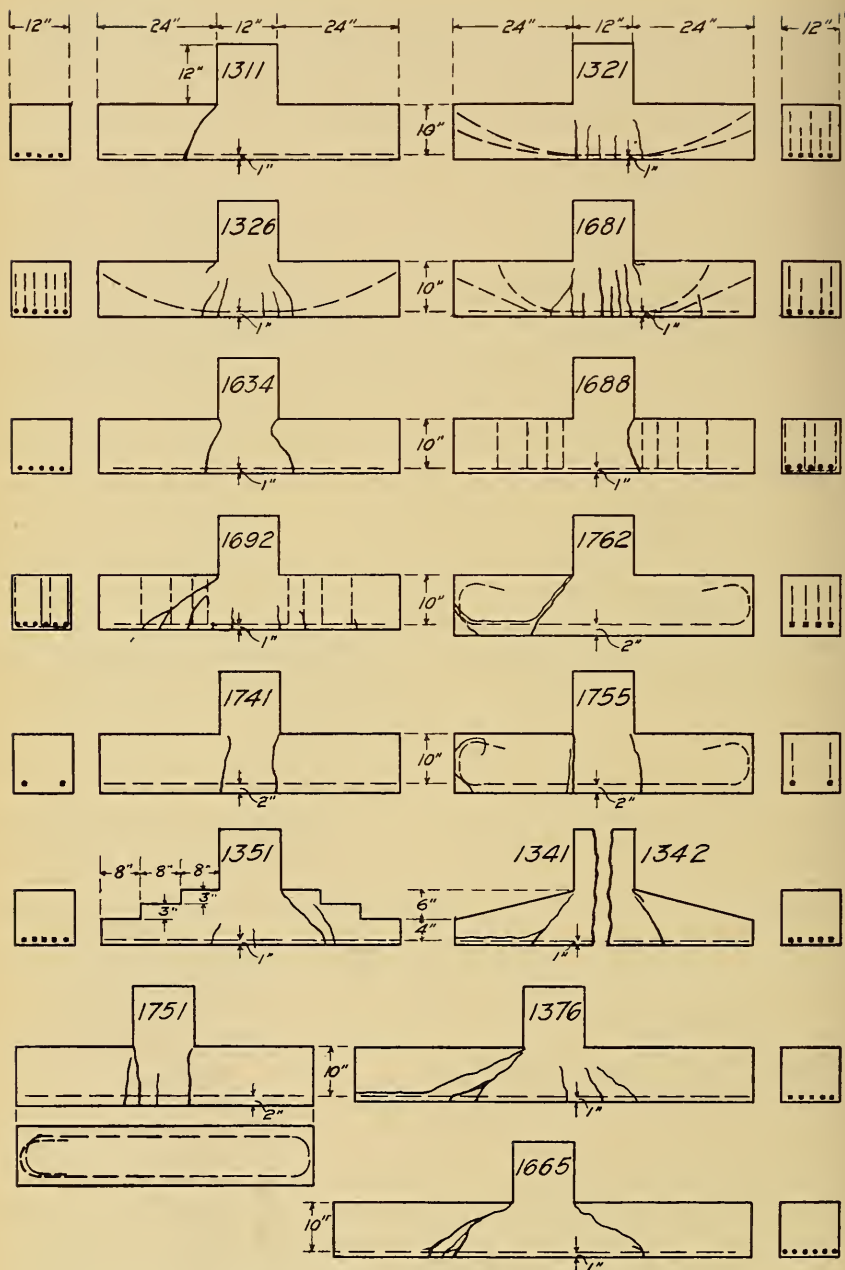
REINFORCED CONCRETE WALL FOOTINGS.
